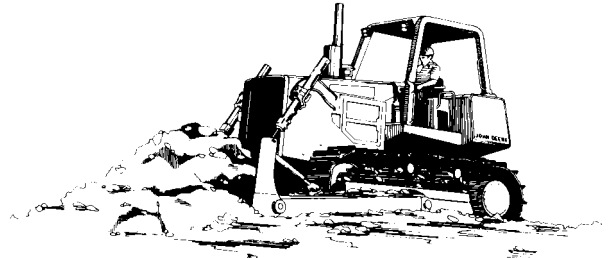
Crawler tractor with dozer blade. (John Deere.)
